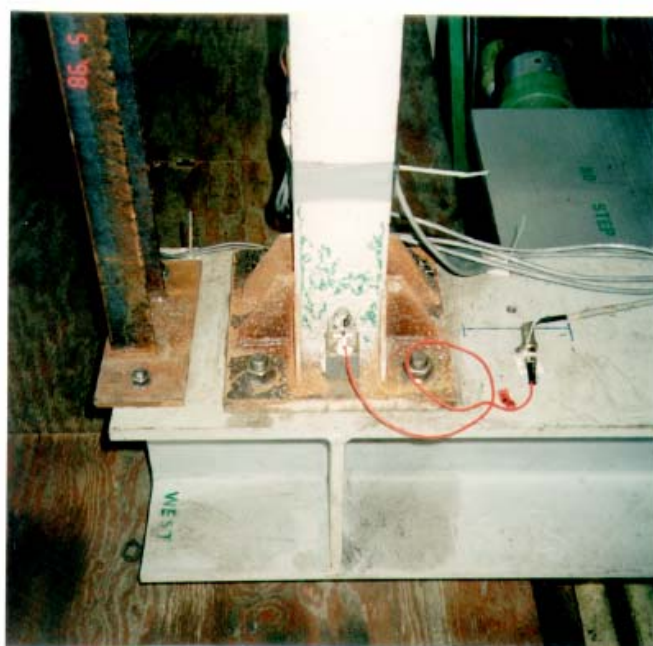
Damage at Column Bottom after Testing (Test CB1)
